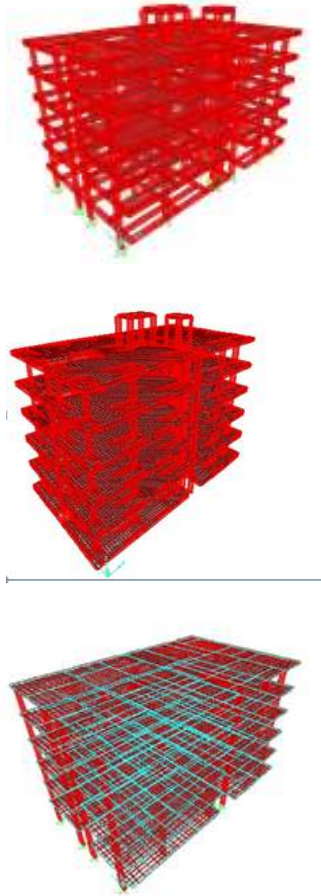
a). Conventional slab model building; b) Flat slab model building; c) bubble deck slab model building
